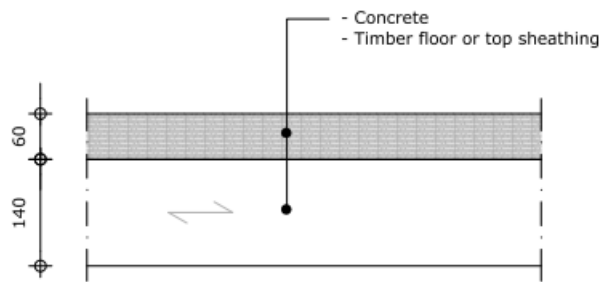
Lay-up timber plus concrete water-resistant layer in mm
